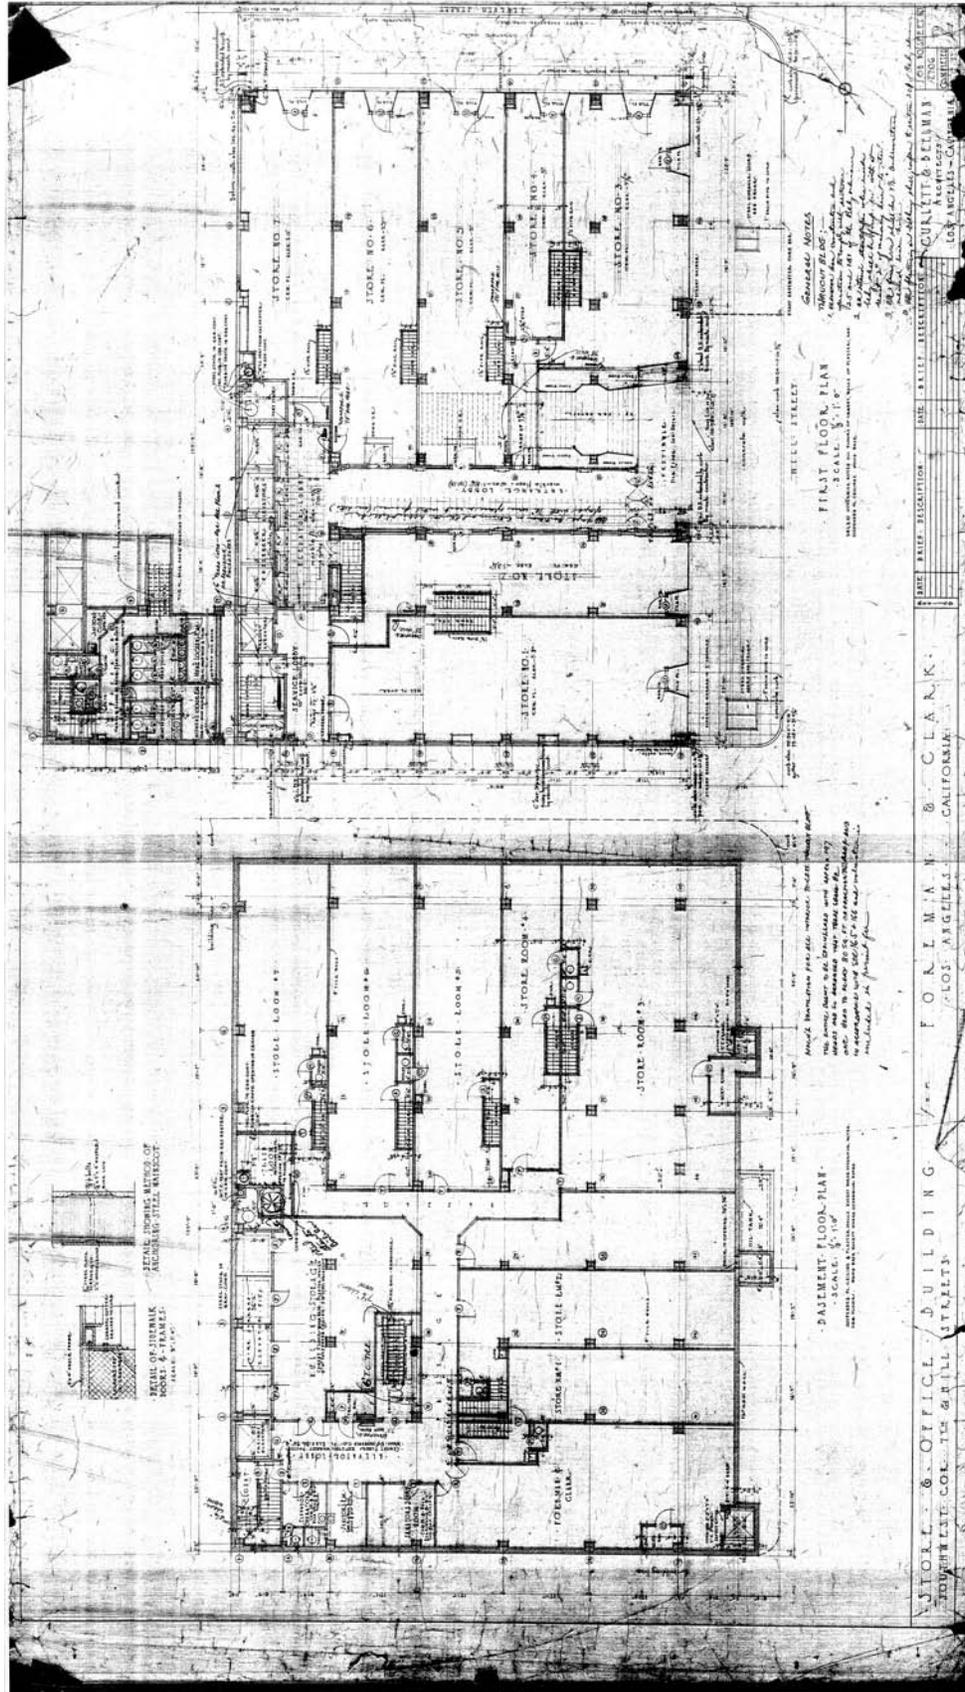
Construction plans for the basement and first floors of the Foreman & Clark building. (Curlett and Beelman Architects.)
